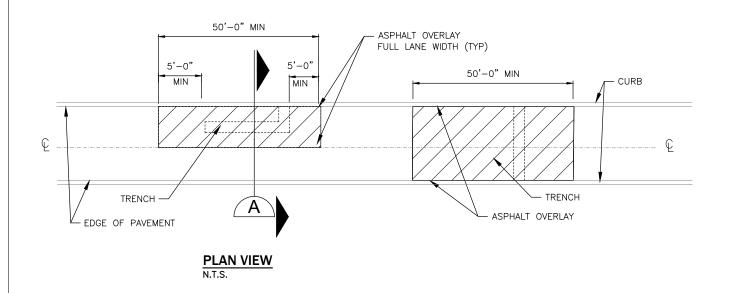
DETAIL COMPACTION REPAIR STANDARD TRENCH AND
